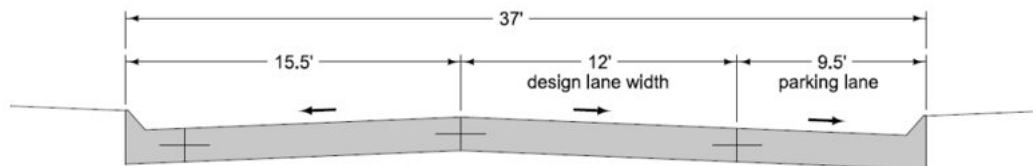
A typical pavement cross-section from Iowa DOT Design Manual Chapter 3A-1
